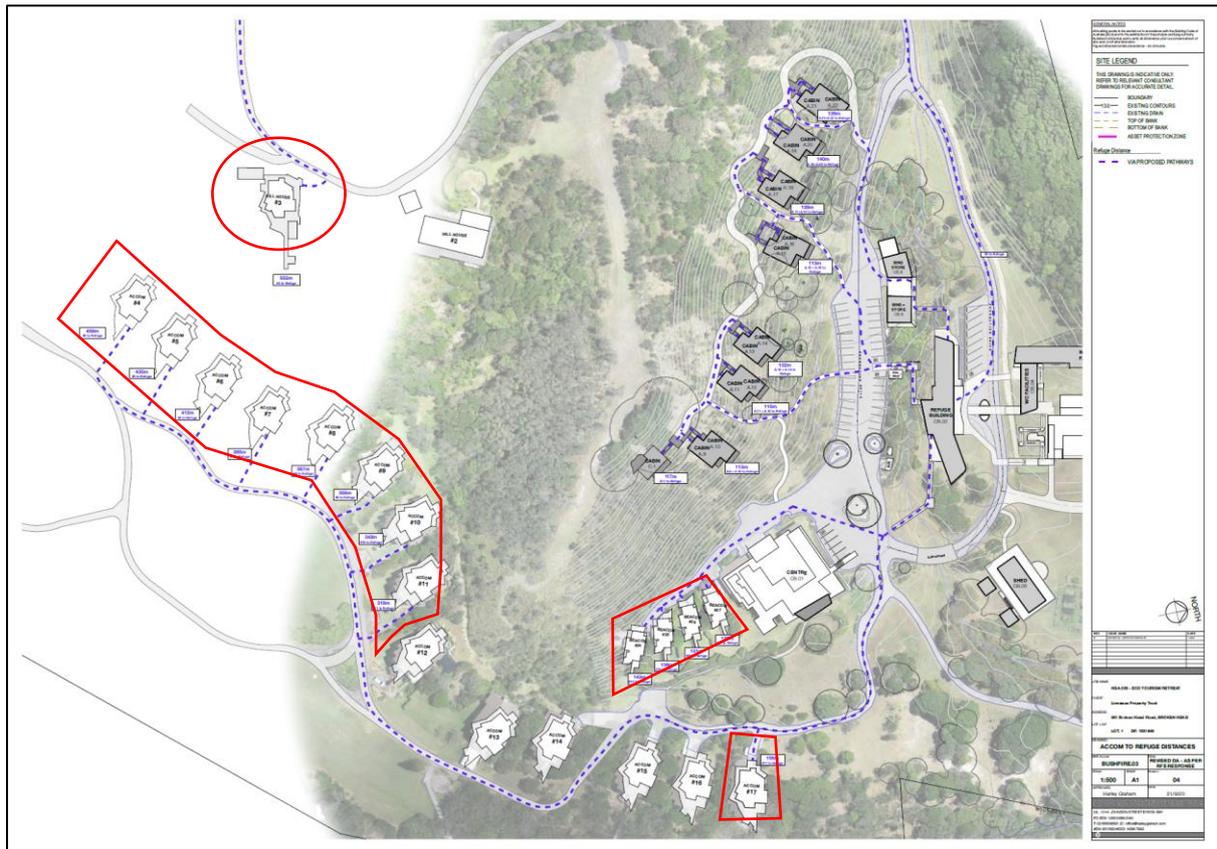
Southern precinct of the development consists of existing private education accommodation buildings sought to also be used for eco-tourism cabins.
